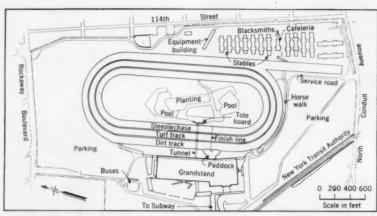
Plot plan of new Aqueduct Race Track of the New York Racing Association. Inc., near Idlewild Airport.
